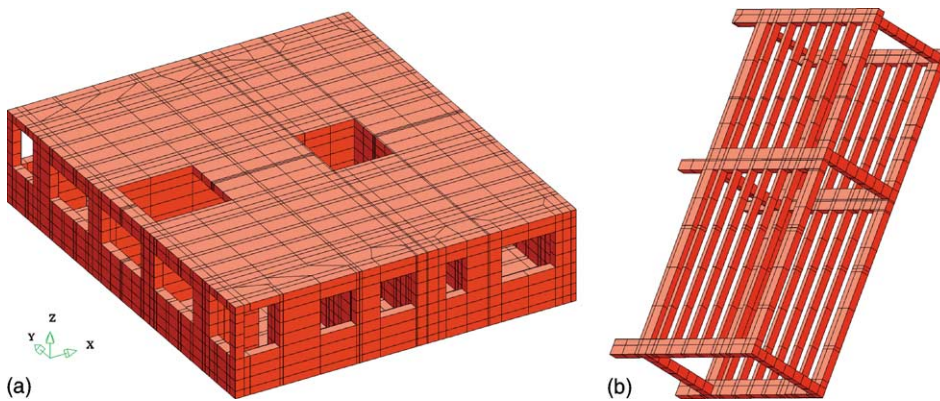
Third floor mesh. Reinforcement bearing members of half structure.
